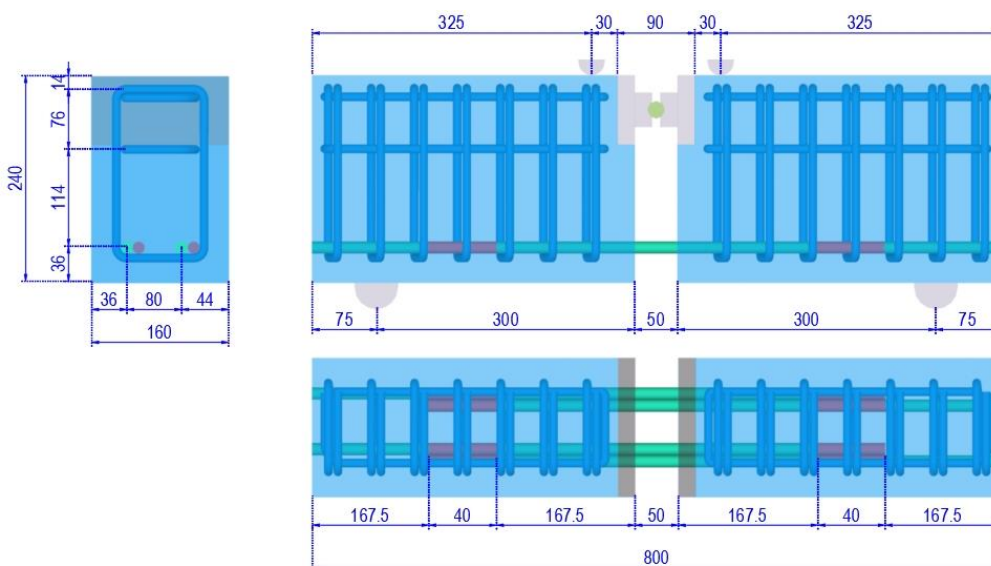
Reinforcement details of splice hinged beam and dimensions.
